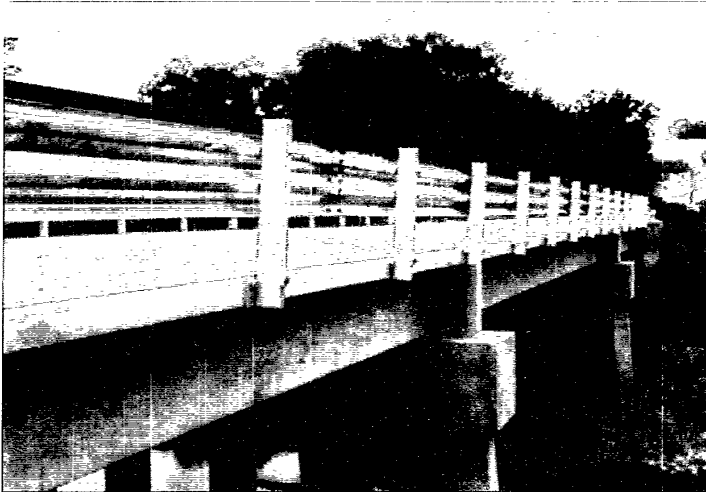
Side-Mounted Thrie-Beam Bridge Railing
